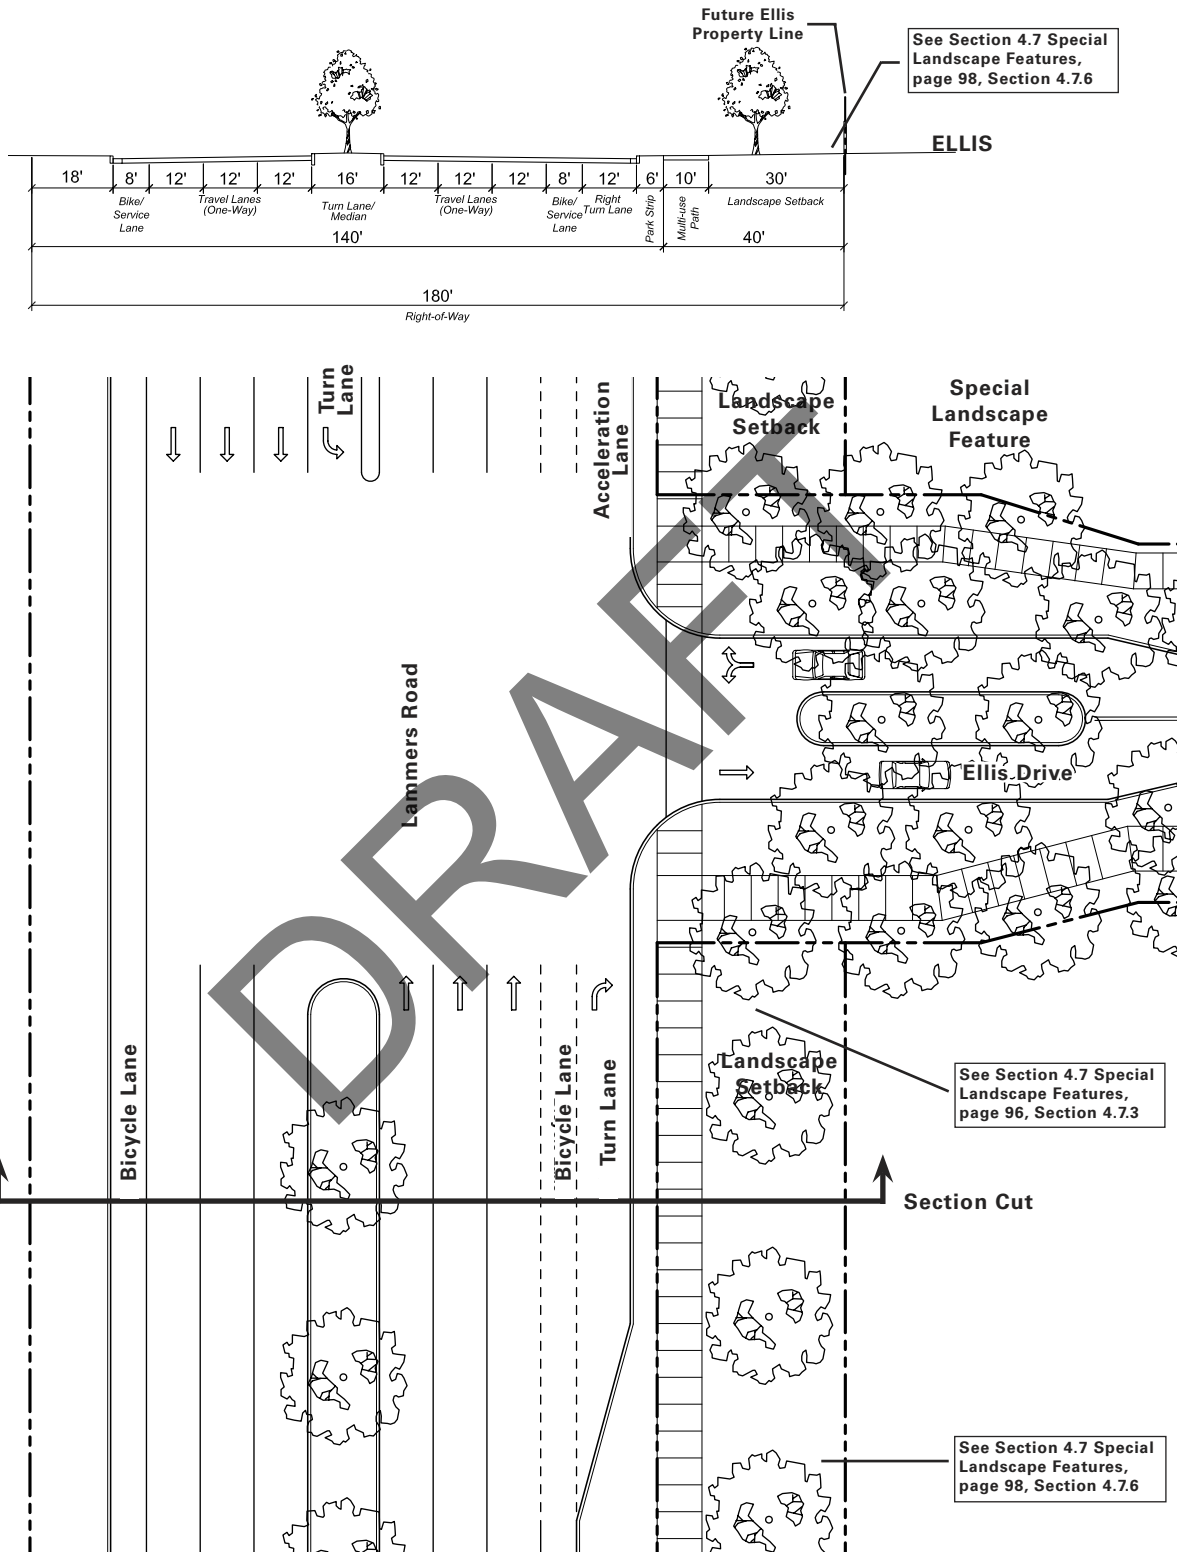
Build-out Section and Plan: Regional Arterial – Lammers Road, Designation A (Final Build-out)
